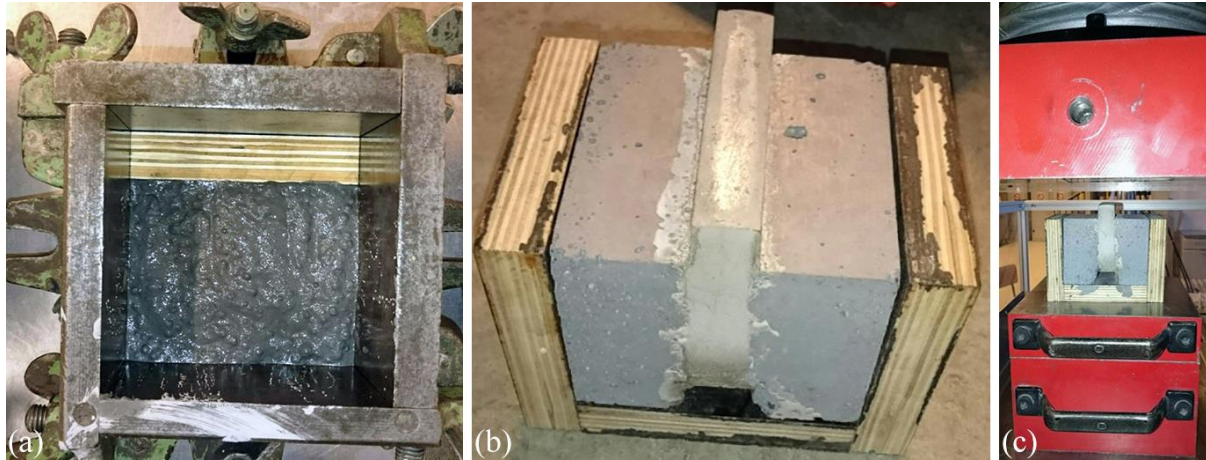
Shear bond strength test (a) casting with a rough surface (b) specimen (c) testing
